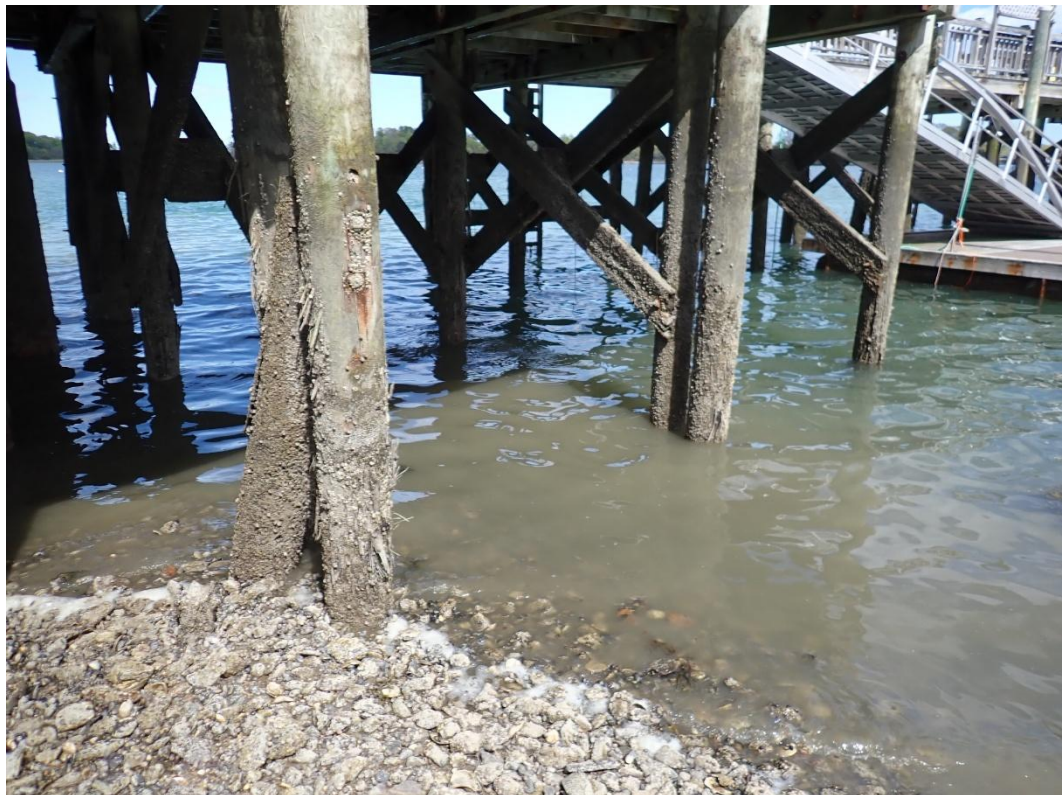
Timber piles with deterioration and section loss to be wrapped.
